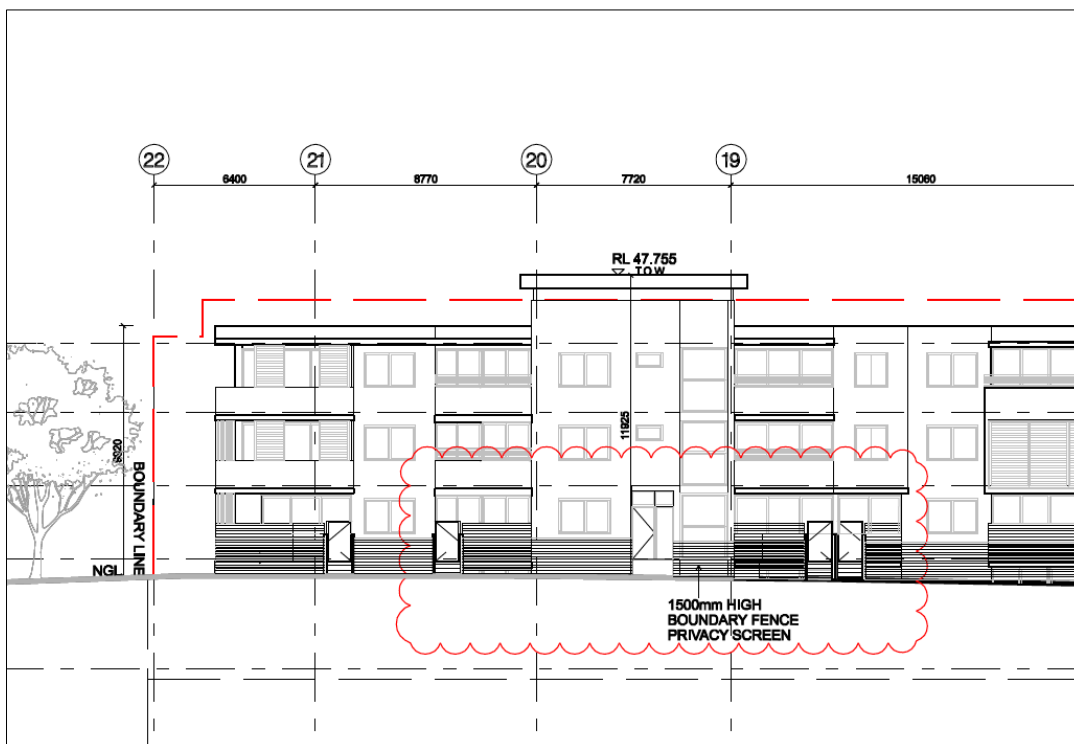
Detail from the approved Albert Street elevation, showing approved 1.5m high fence to Albert Street.
